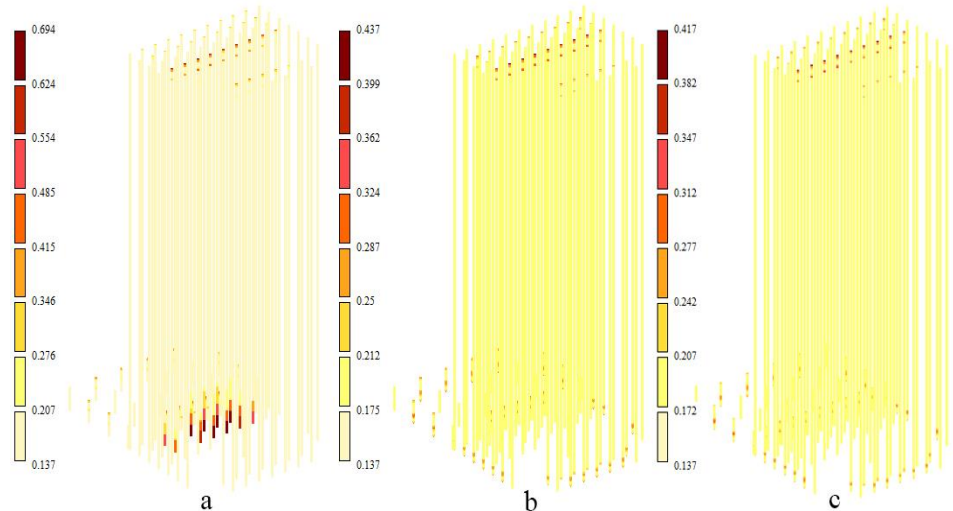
Percentage of reinforcement taking into account crack resistance (a – concrete B40; b – steel fiber reinforced concrete; c – basalt fiber reinforced concrete).
